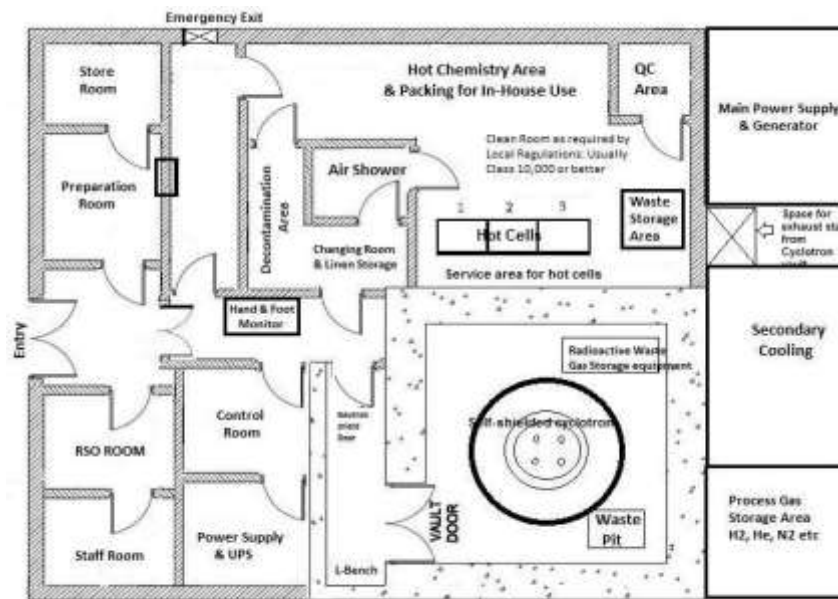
Floor plan of a typical Type I Medical Cyclotron Facility
